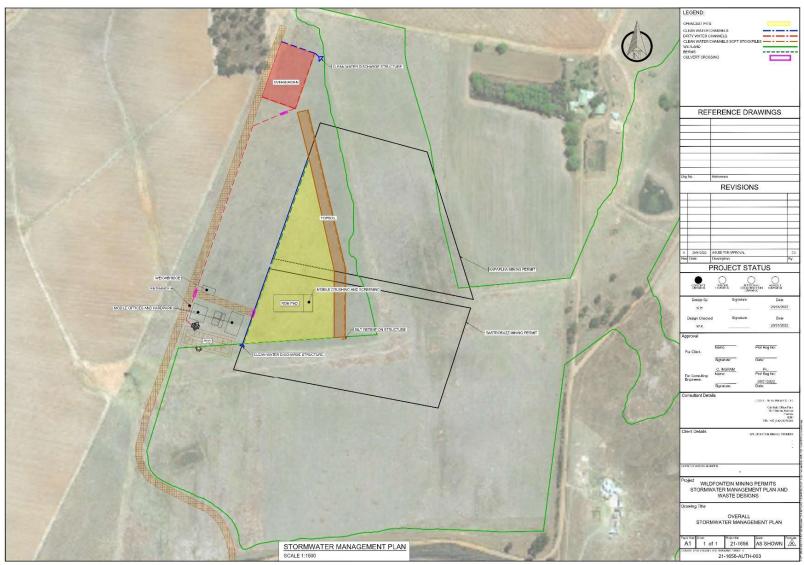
Proposed layout for the Wildfontein Mining Development (Supplied by Eco Elementum 2022).
